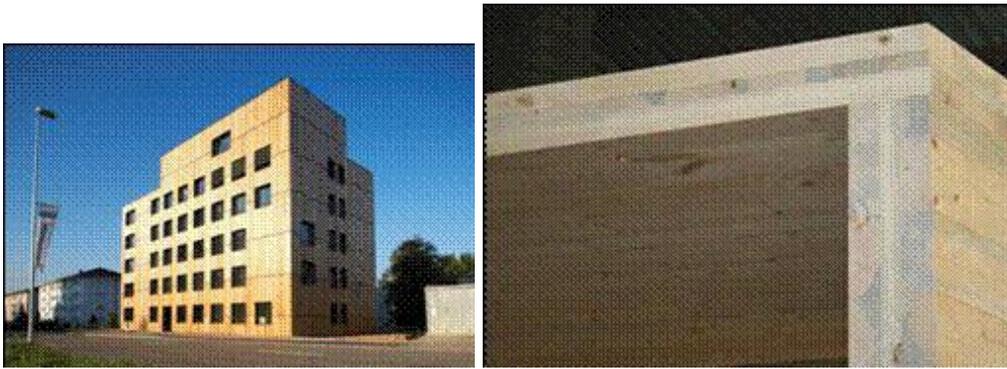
example of mid rise wood building - 6-storey structure in Steinhausen, Switzerland and cross laminated construction
